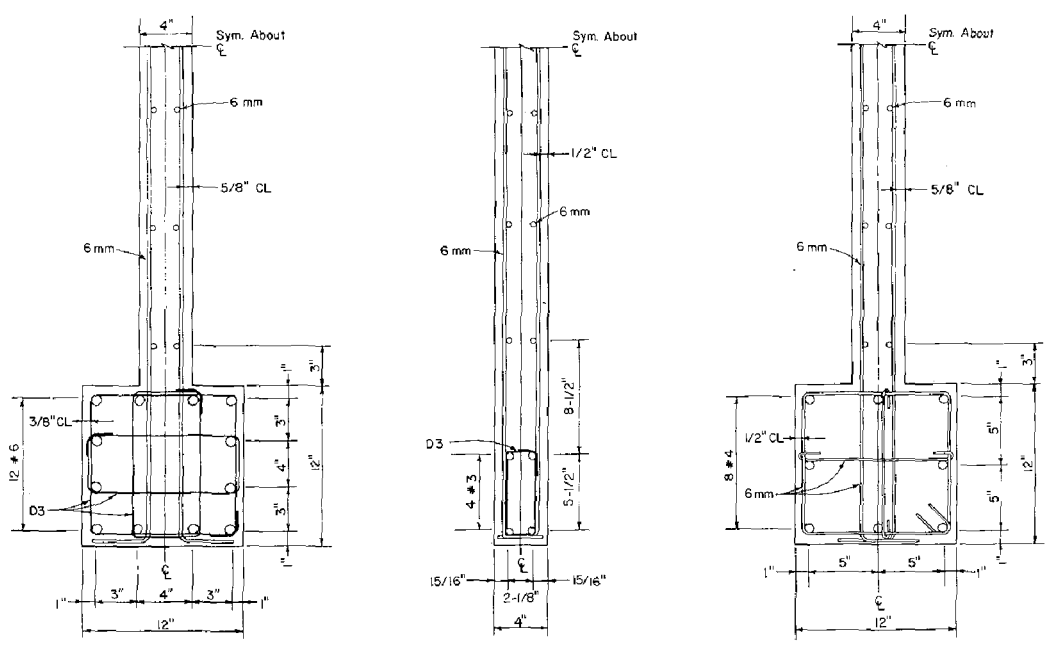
Nominal Dimensions of Test Specimen With Rectangular Cross Section (1 in. = 25.4 mm)
